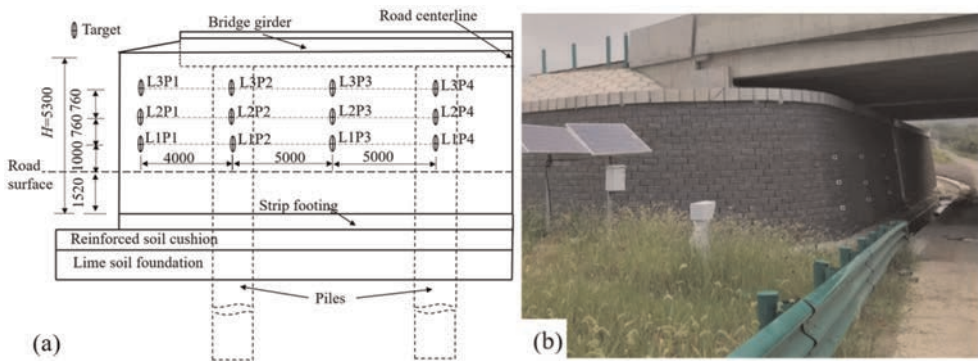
Instrumentation layout: (a) Schematic of the instrument layout (Unit: mm); (b) Filed installation.
